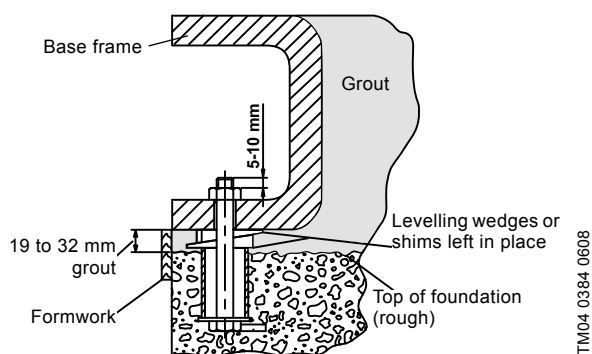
Sectional view of foundation with anchor bolt, grouting and base frame
